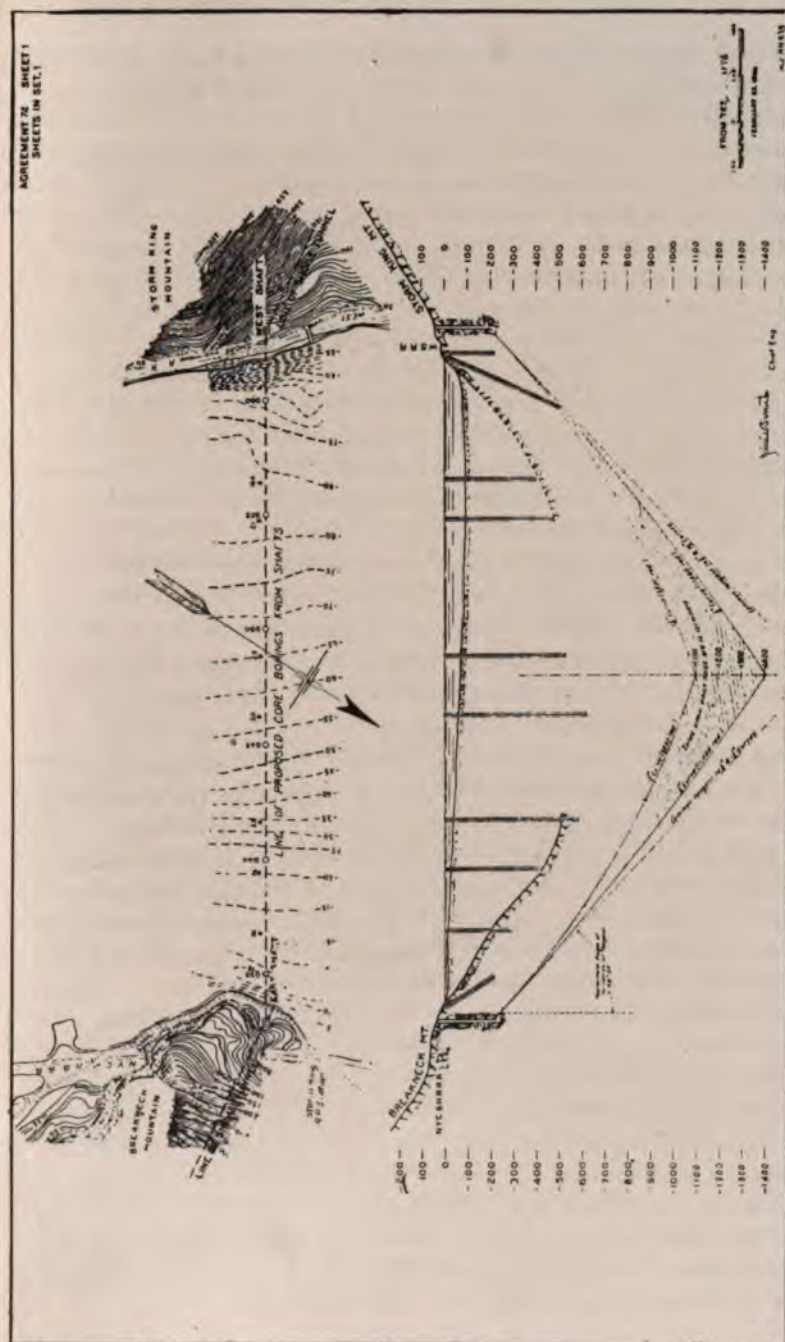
Catskill Aqueduct, Cross Section of Hudson River Crossing, showing Zones Designed for Diamond Drill Borings.
